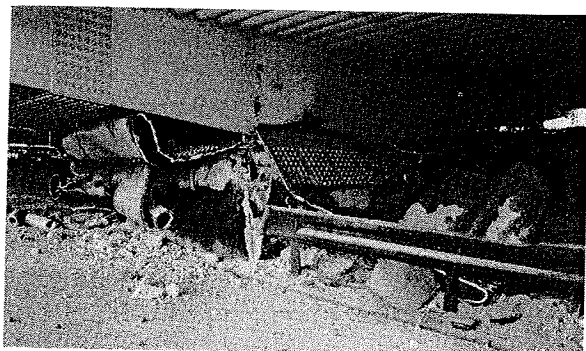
Failure of a Steel Pier, Tateishi, Route 3, Kobe Line, Hanshin Expressway
